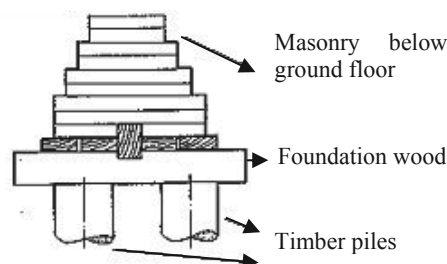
Typical cross section of base of the wall in masonry buildings (Zantkuyl 1993)
